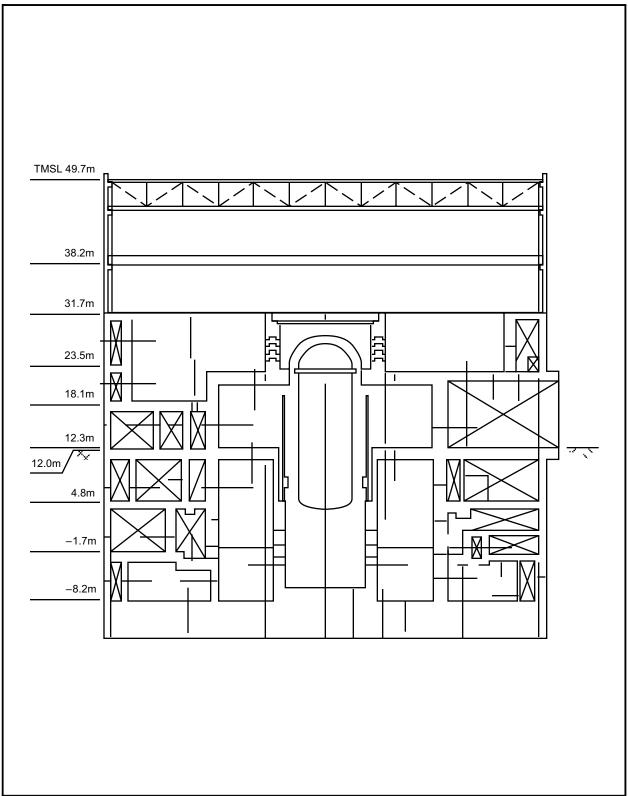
Reactor Building Elevation (0°-180° Section)
